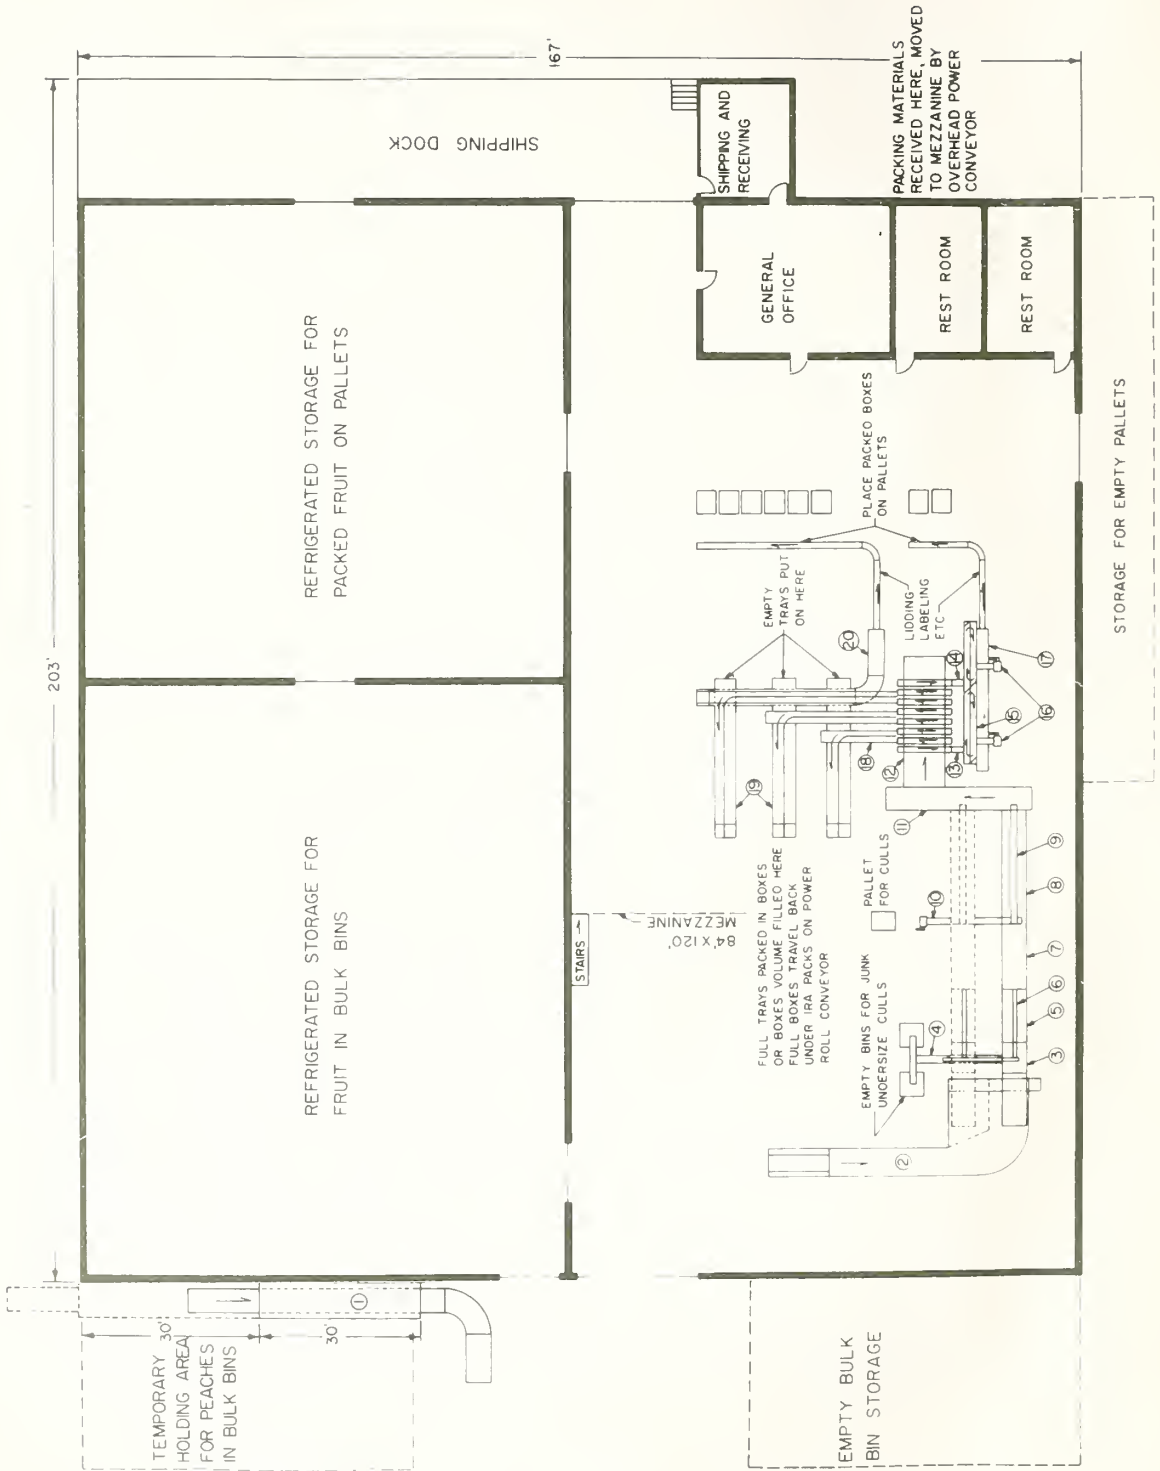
Proposed layout for a peach-packing facility near Campbell, Missouri
